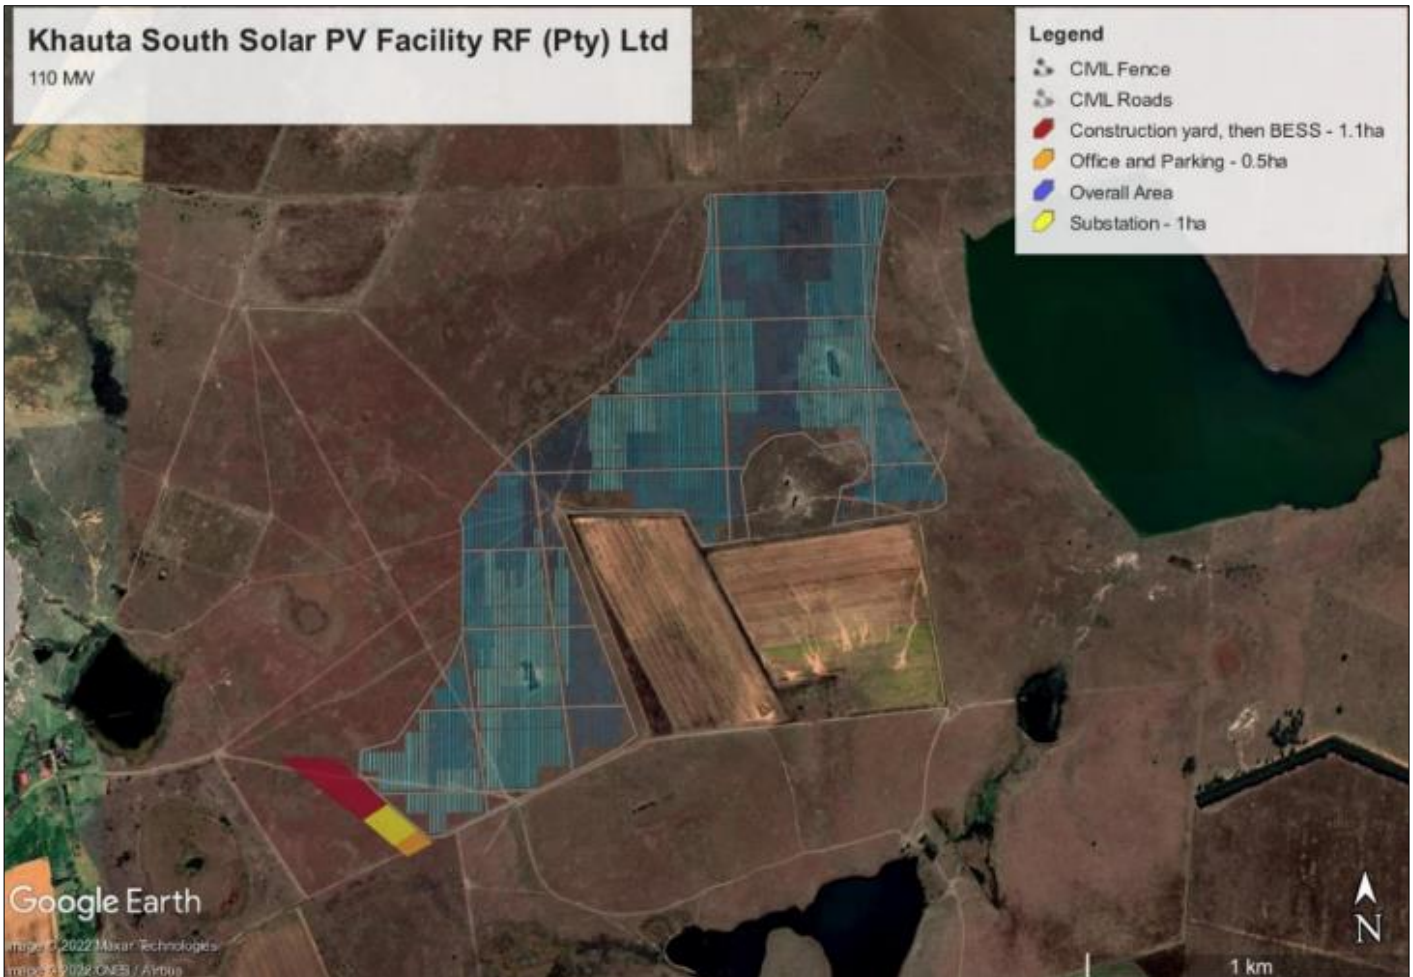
Proposed 110MW Khauta South Solar PV Facility near Riebeeckstad. Preliminary layout of the proposed development.
